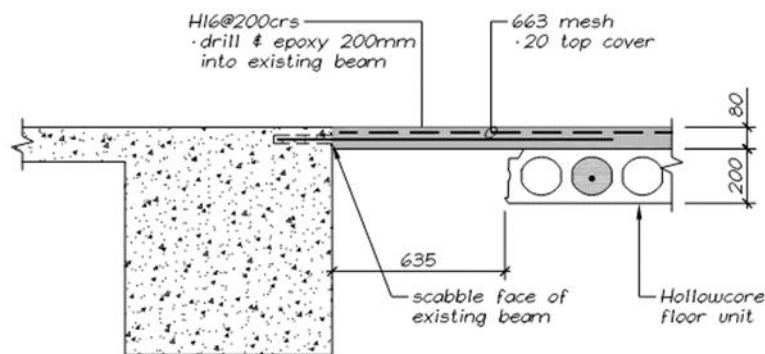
Detail of connection of 2009 annex floor to original concrete beam (Grid D)
